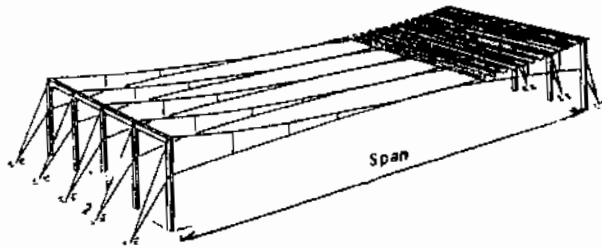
Concave Cable Roof with Corrugated Metal Roof Deck.
